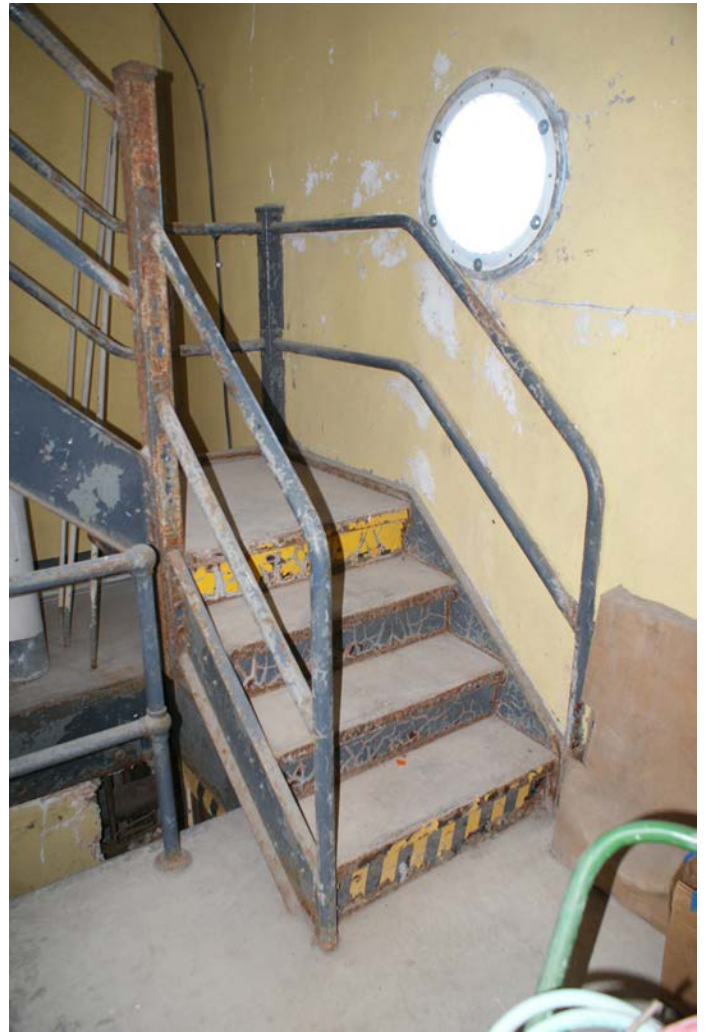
D-214 Stairway from Level 3 leading to tower Level 4.
